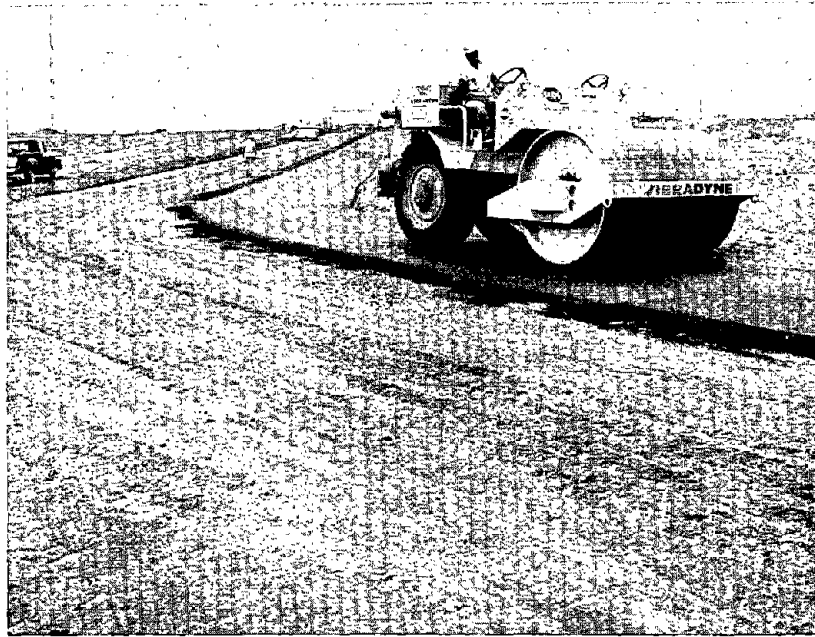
Construction of asphalt pavement on fly ash-modified subgrade.
